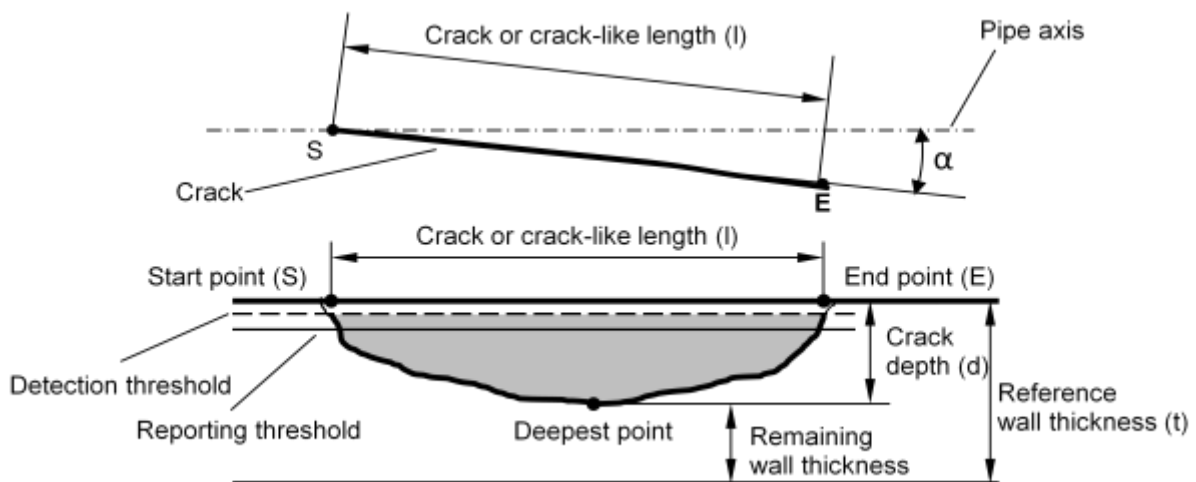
Illustration (top view and cross section) of parameters describing location and dimension of crack and crack-like features.
